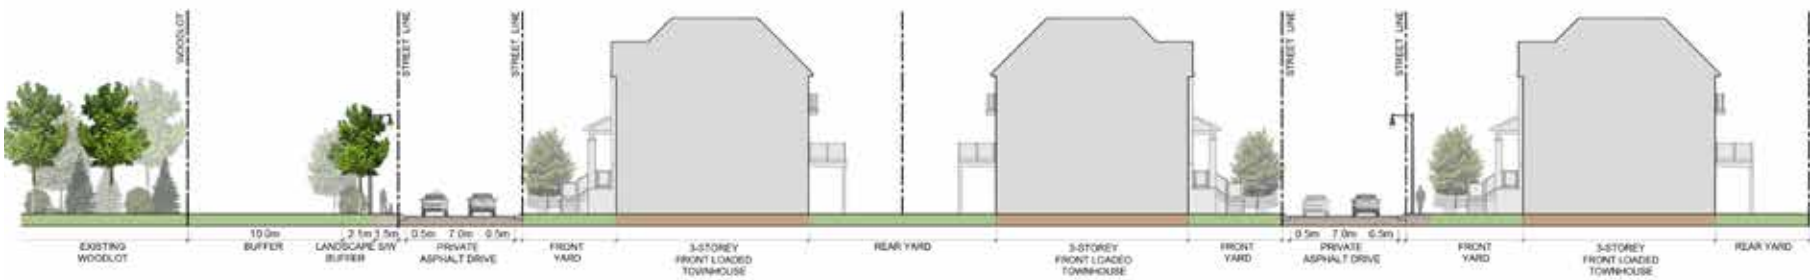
Section E: 6m private road interface with existing woodlot and landscape buffer
